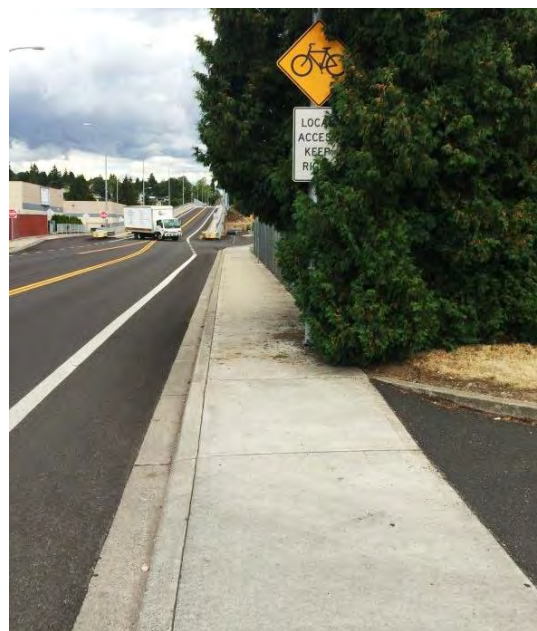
39th Street Condition 2: East of Railroad Bridge
